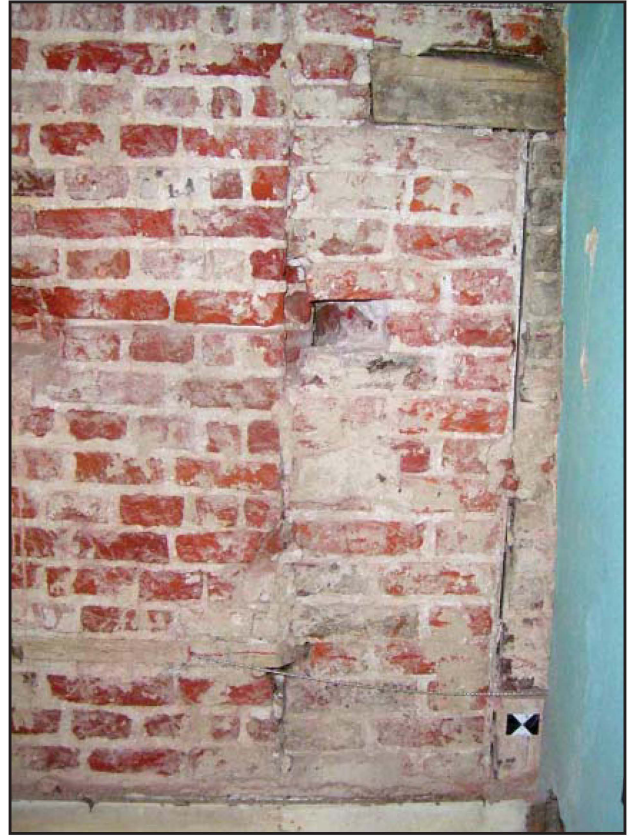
East elevation, internal view, second floor, illustrating 17th century window (plaster and lintel)
